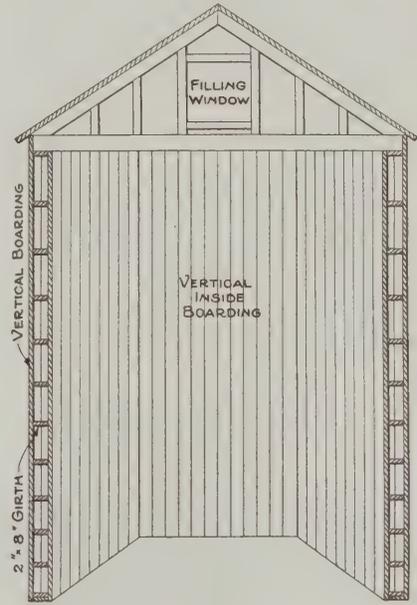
A. Vertical Cross Section of the Silo Showing the Wall Construction and Inside Boarding
